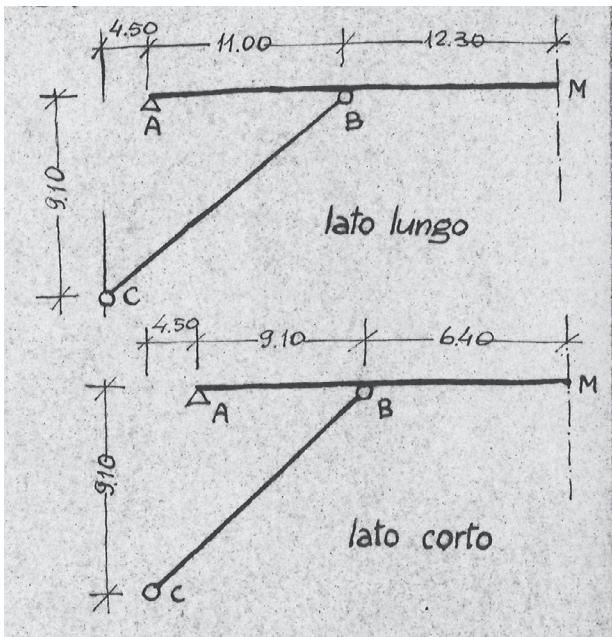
| Hall C Calculation Report, long and short side frame scheme (Nervi, 1950).
